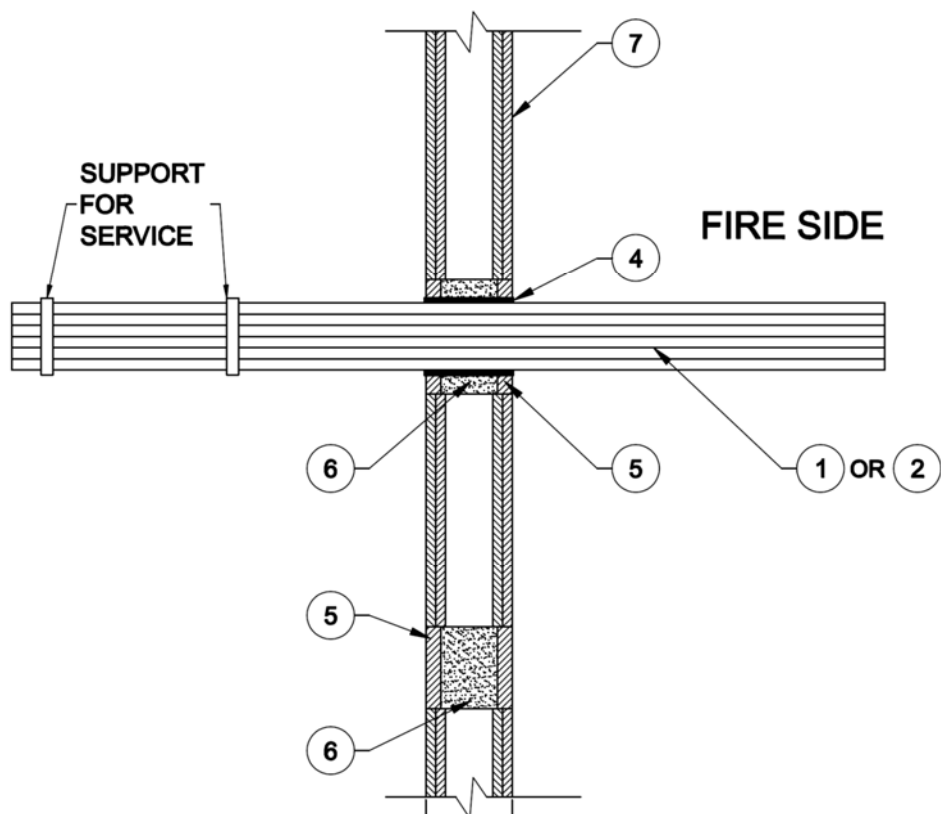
Typical detail for unwrapped cables and blank penetration seals in plasterboard walls
